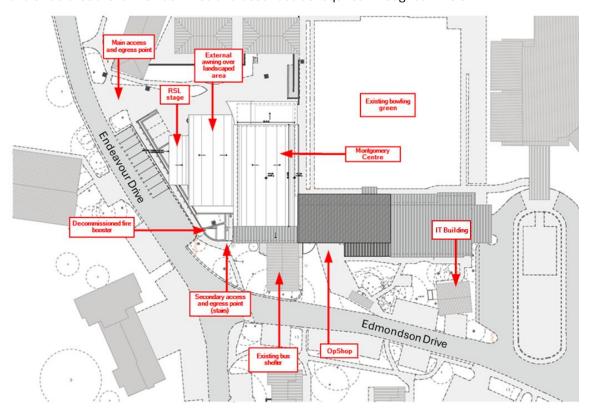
Existing Development and Site Context Source: McNalley Architects, Planning & Co.
